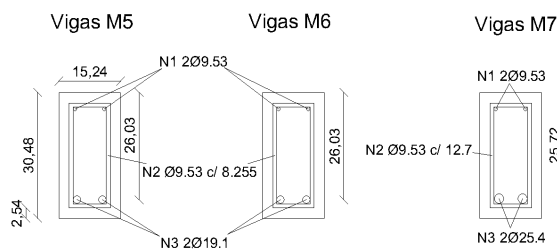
M5 to M7 beams cross section (dimensions in cm and bars diameter in mm).
